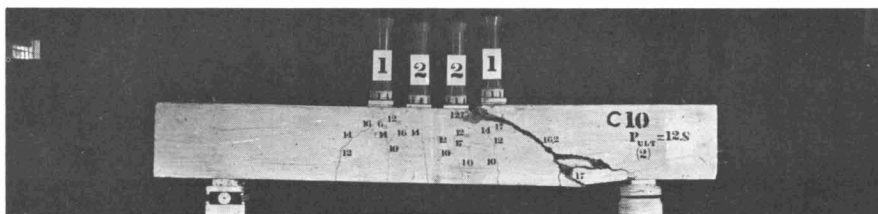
Beams with 18 in. Shear Span and 24 in. Overhang
